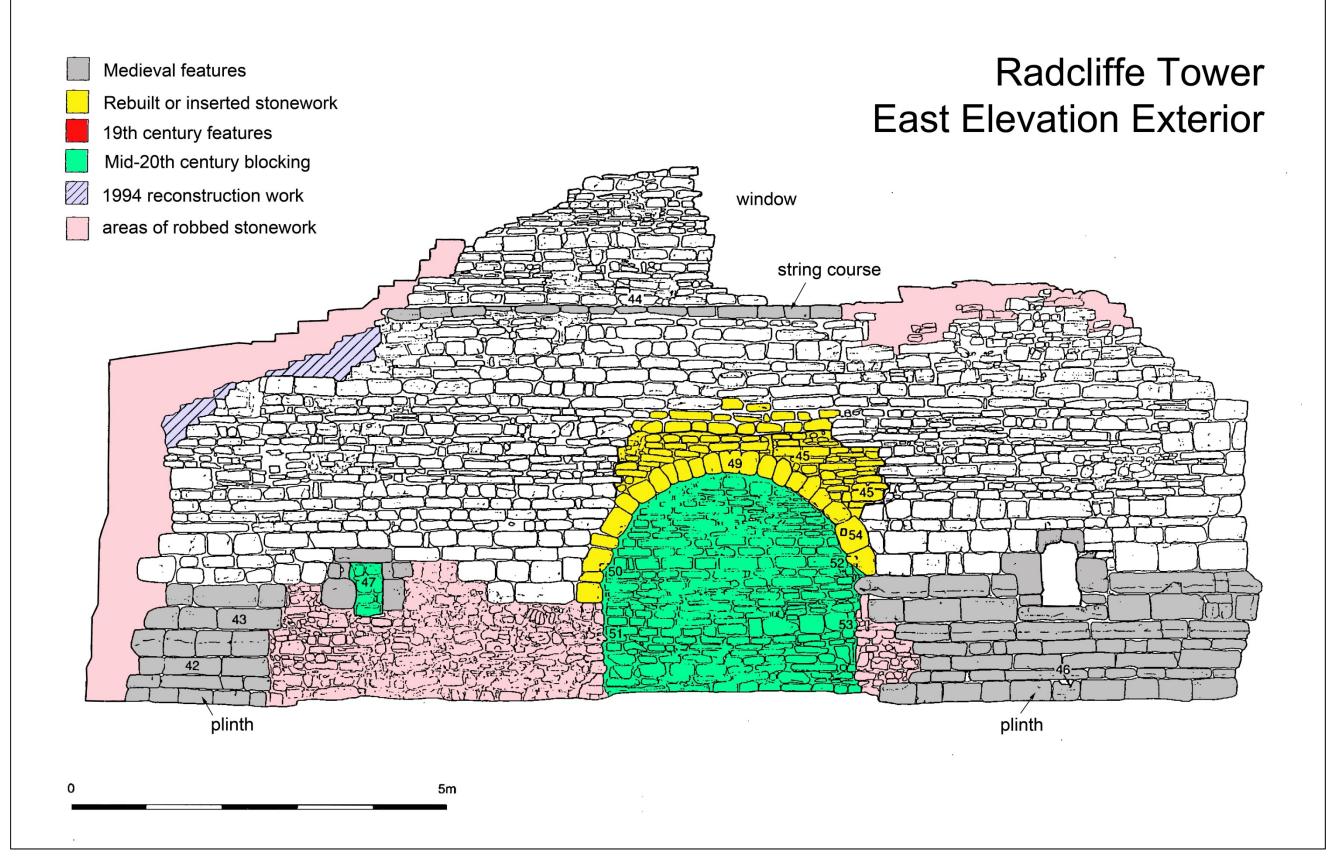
Radcliffe Tower eastern elevation exterior 2014.
